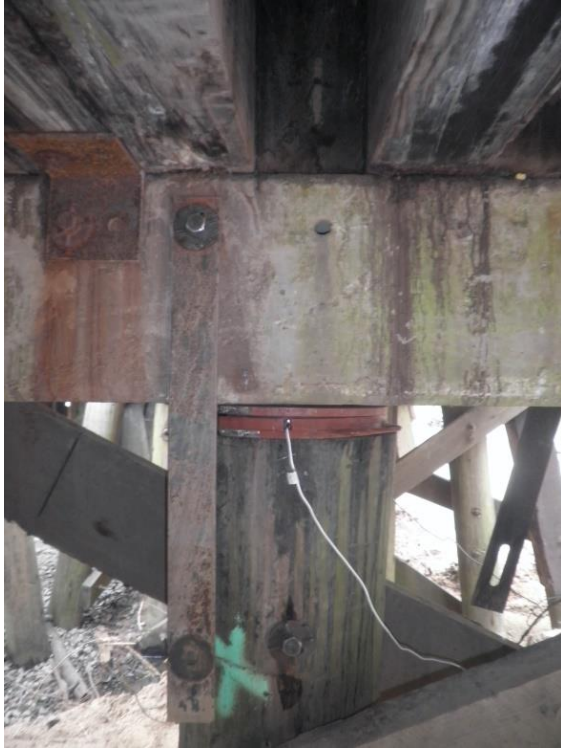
Steel plate surrounding two load cells placed on top of timber pile
